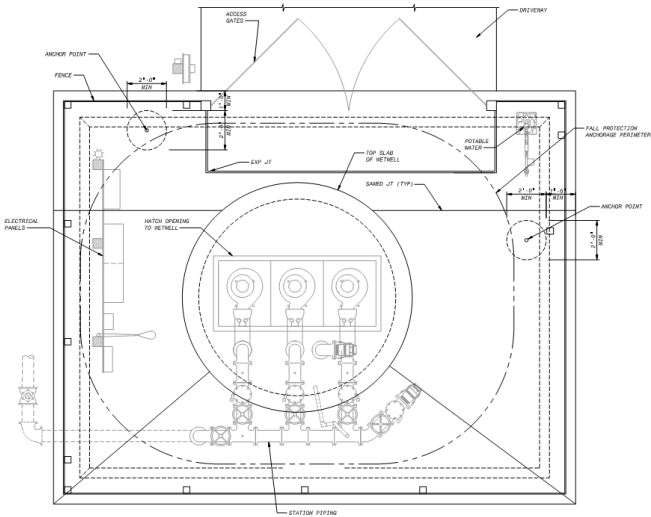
Existing pump station standard layout/configuration with new anchor points.
